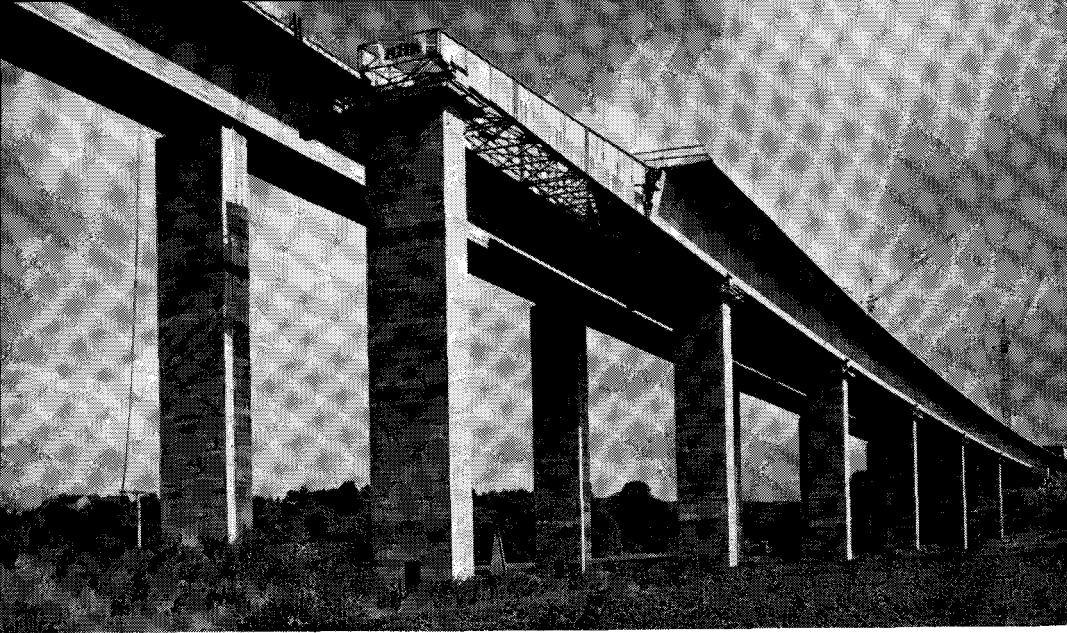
Incremental launching of continuous bridge girders, fabricated behind abutment (Taktchiebeverfahren).
